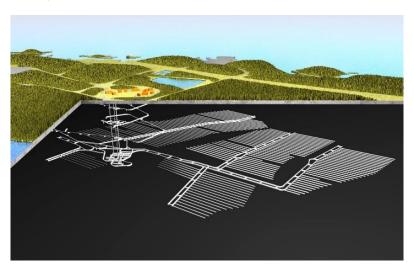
The facility contains deposition tunnels, central tunnels and technical auxiliary facilities.
